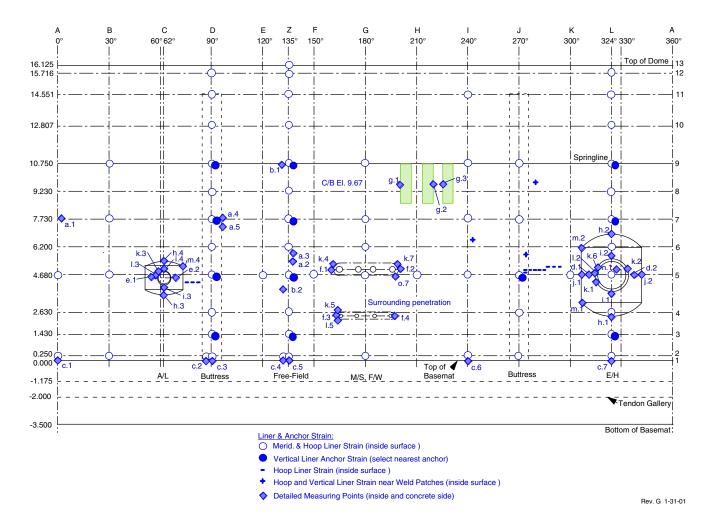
Liner and Liner Anchor Instrumentation Locations
